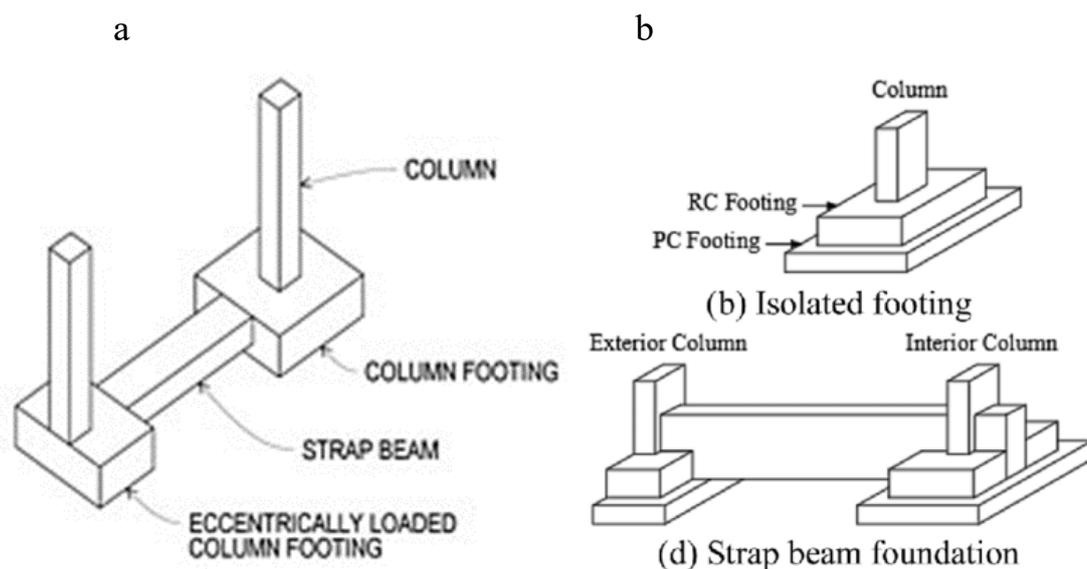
Foundations of the building: a – scheme of arrangement strap beam foundation; b – scheme of placing plain concrete (PC) and reinforced concrete (RC)
